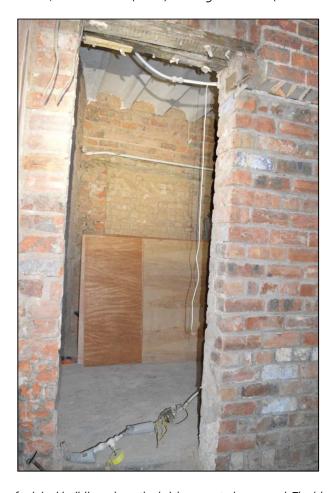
Doorway to rear of original building where the brick seems to be re-used. The blocked doorway in the wall behind might indicate there was an earlier yard wall to the rear of the original building (CPAT 4853-0055)
